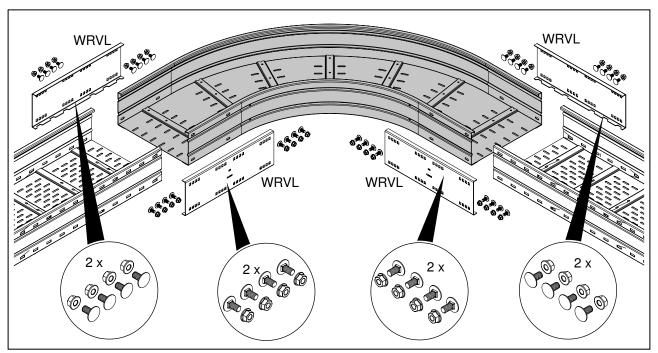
Components for mounting the 90° bend with 160 mm side height
